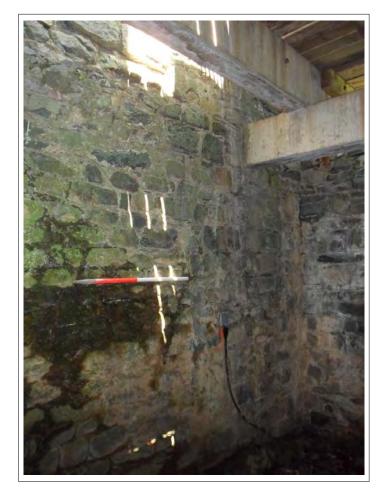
Oblique view of north wall of drawbridge pit, looking north east, Scale 1x1m
